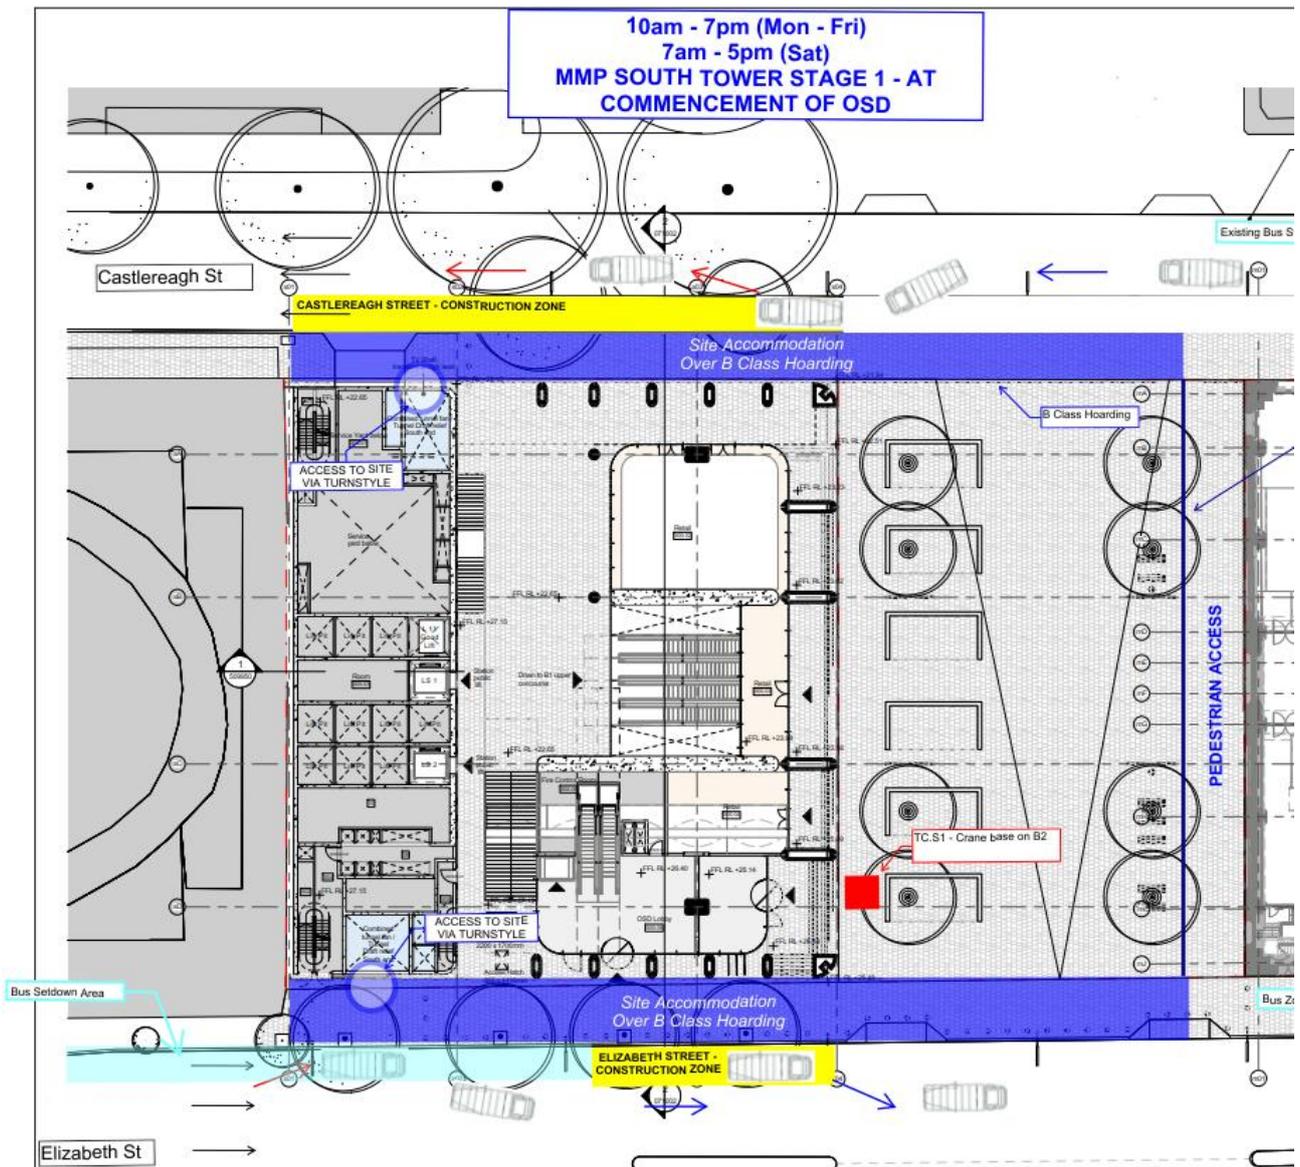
Construction Zoning Stage 1 - 7am - 7pm
